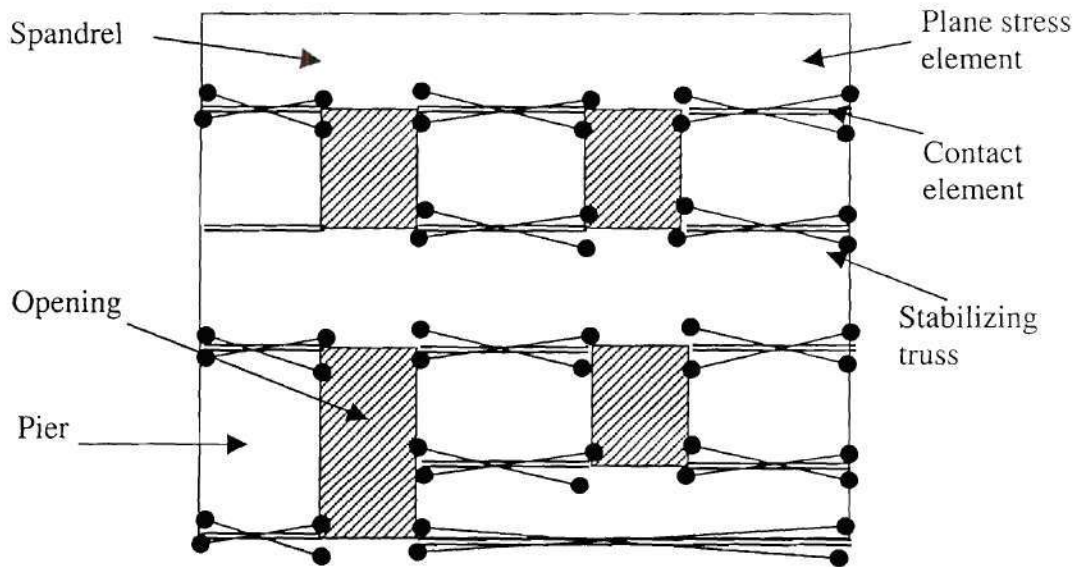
Modeling of a perforated wall with contact elements and stabilizing truss elements
